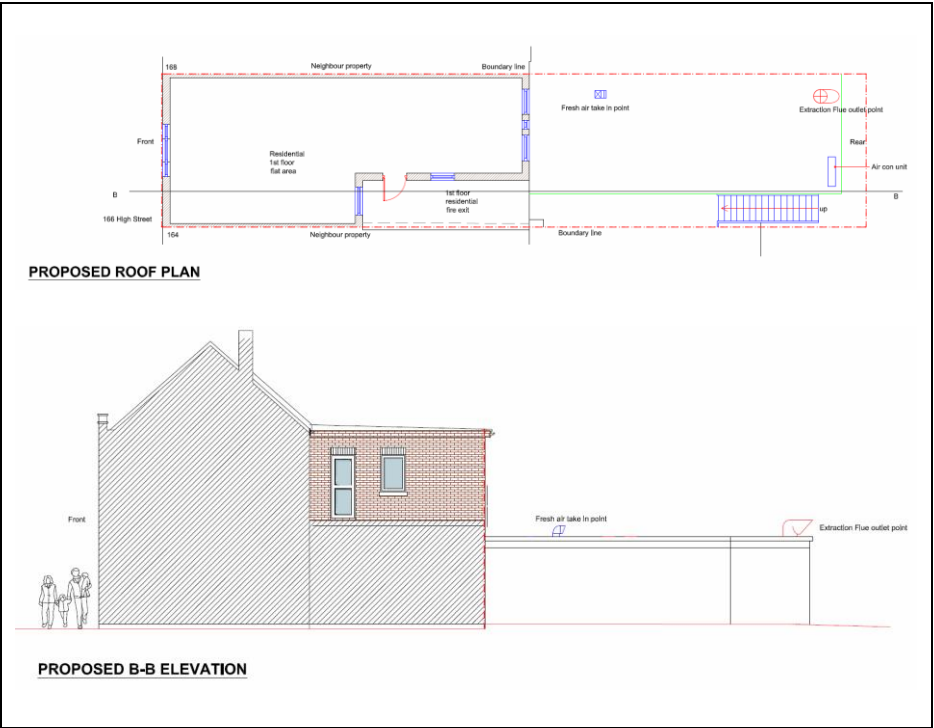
Plans and elevations showing the location of the proposed new fixed plant (larger images can be found in the Appendix)
